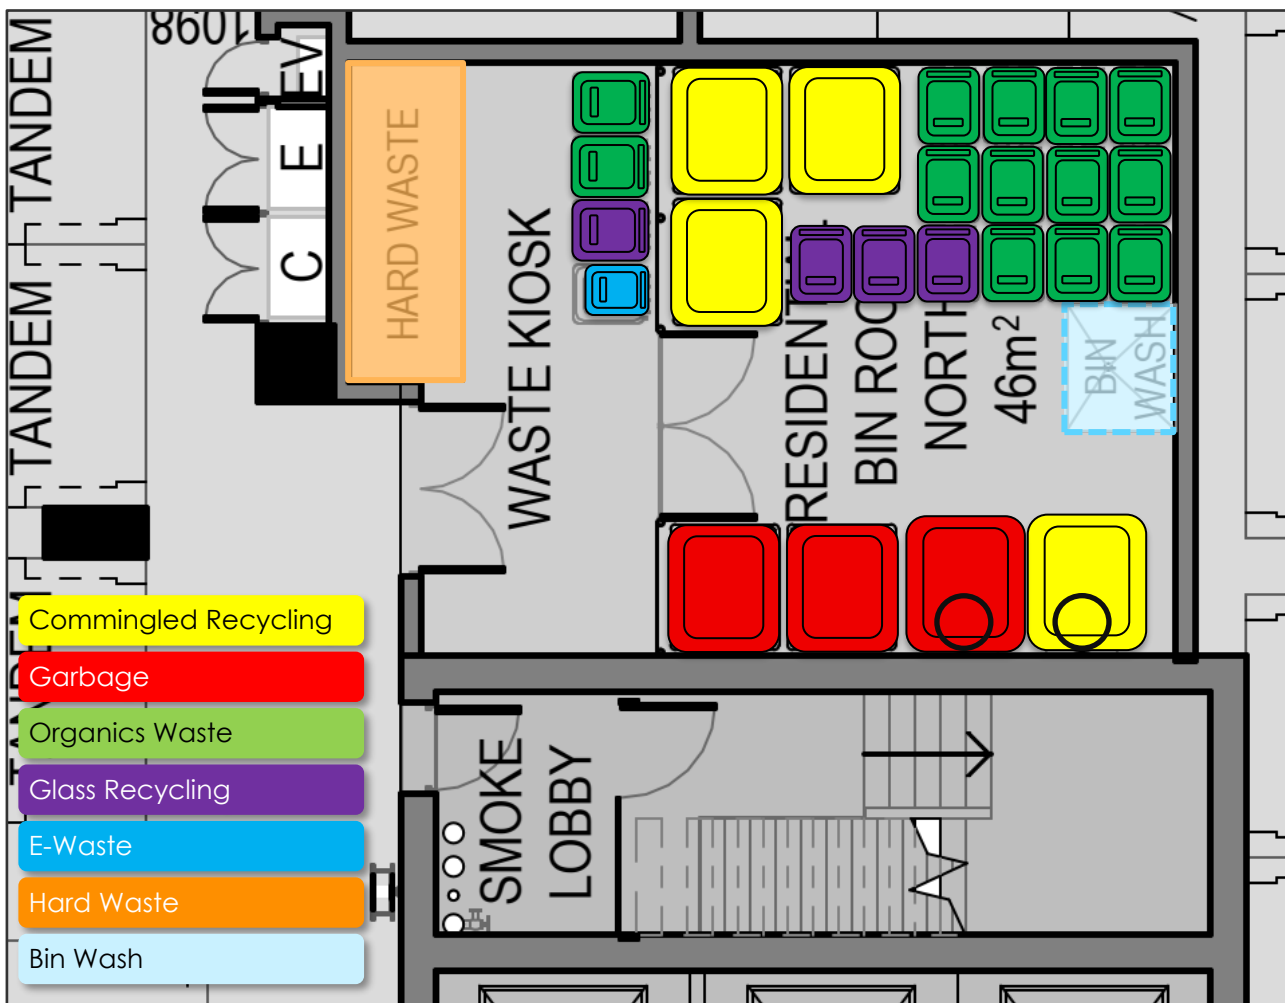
Building B (northern) Residential Bin Storage Room Layout
